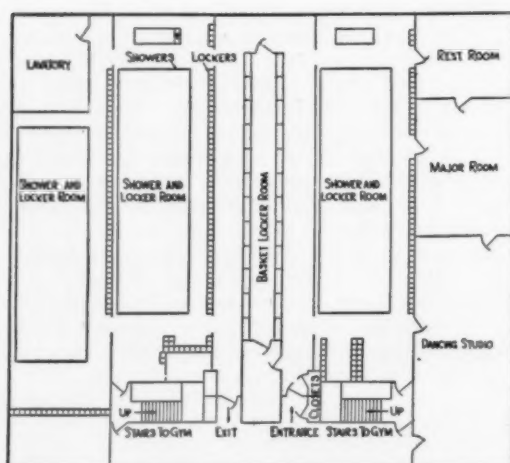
THE LAYOUT OF THE SECOND FLOOR
